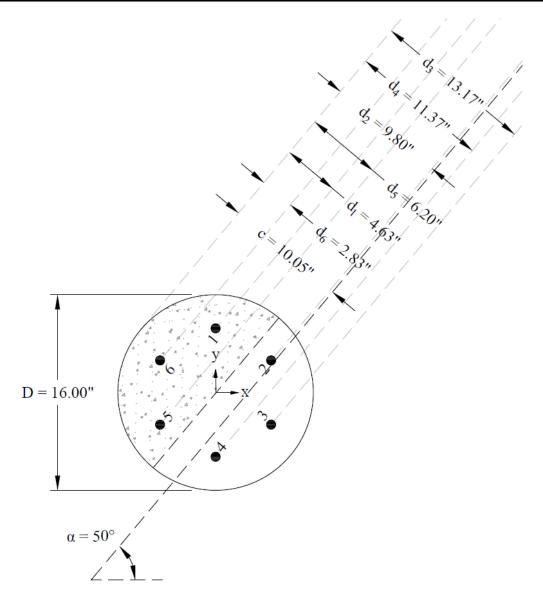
Reinforced Concrete Column Cross-Section and Reinforcement Locations
